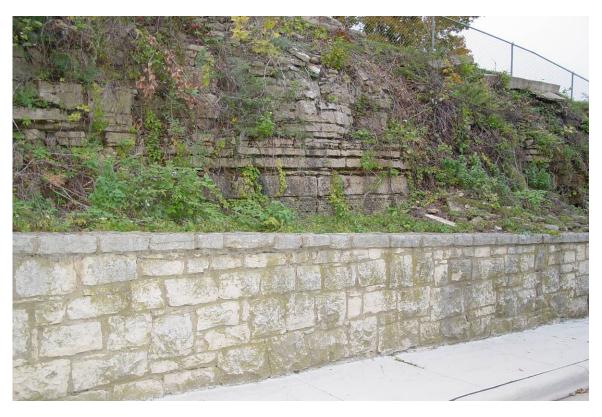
East retaining wall, showing typical orientation to limestone exposure, facing southeast
